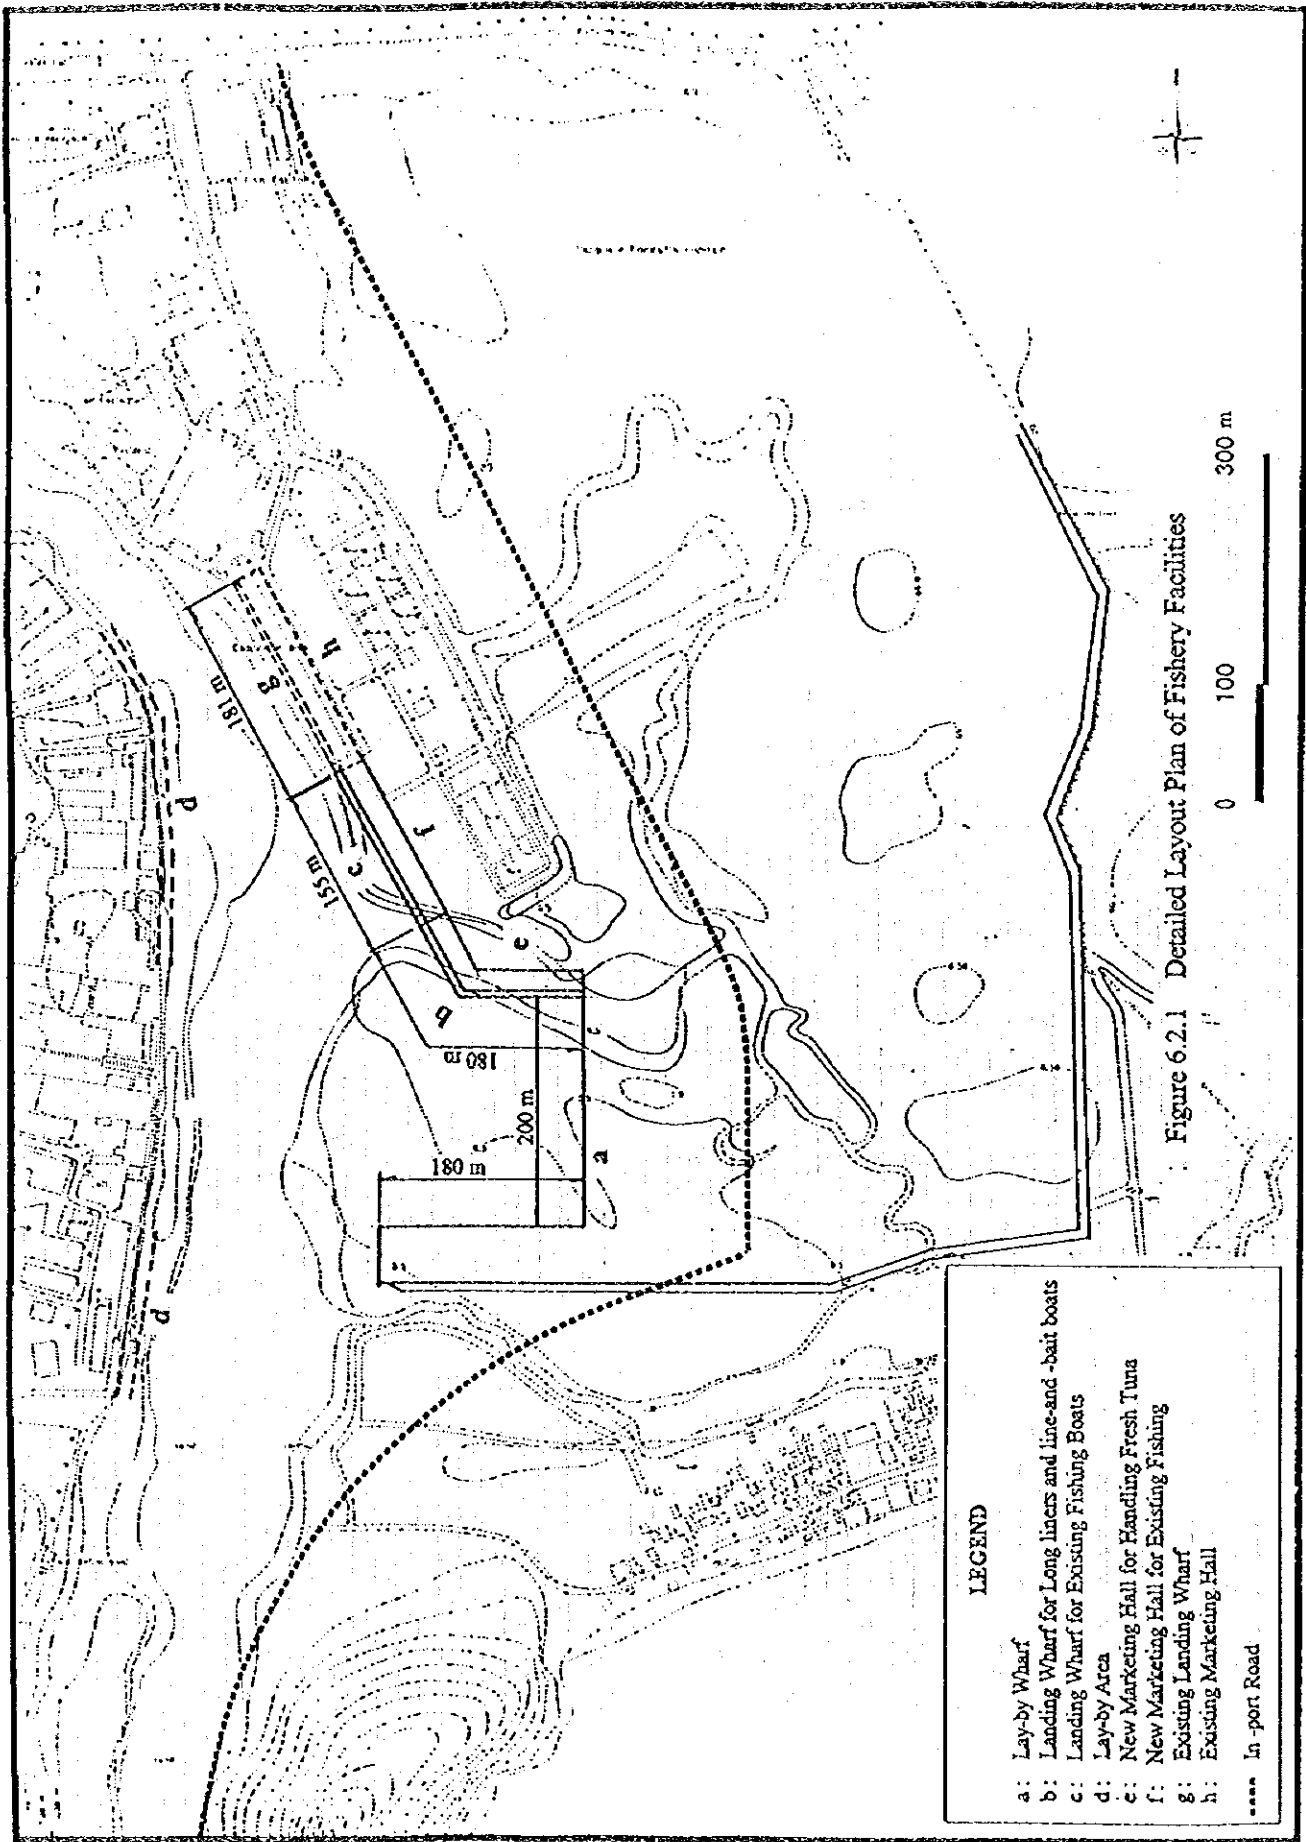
Detailed Layout Plan of Fishery Facilities
